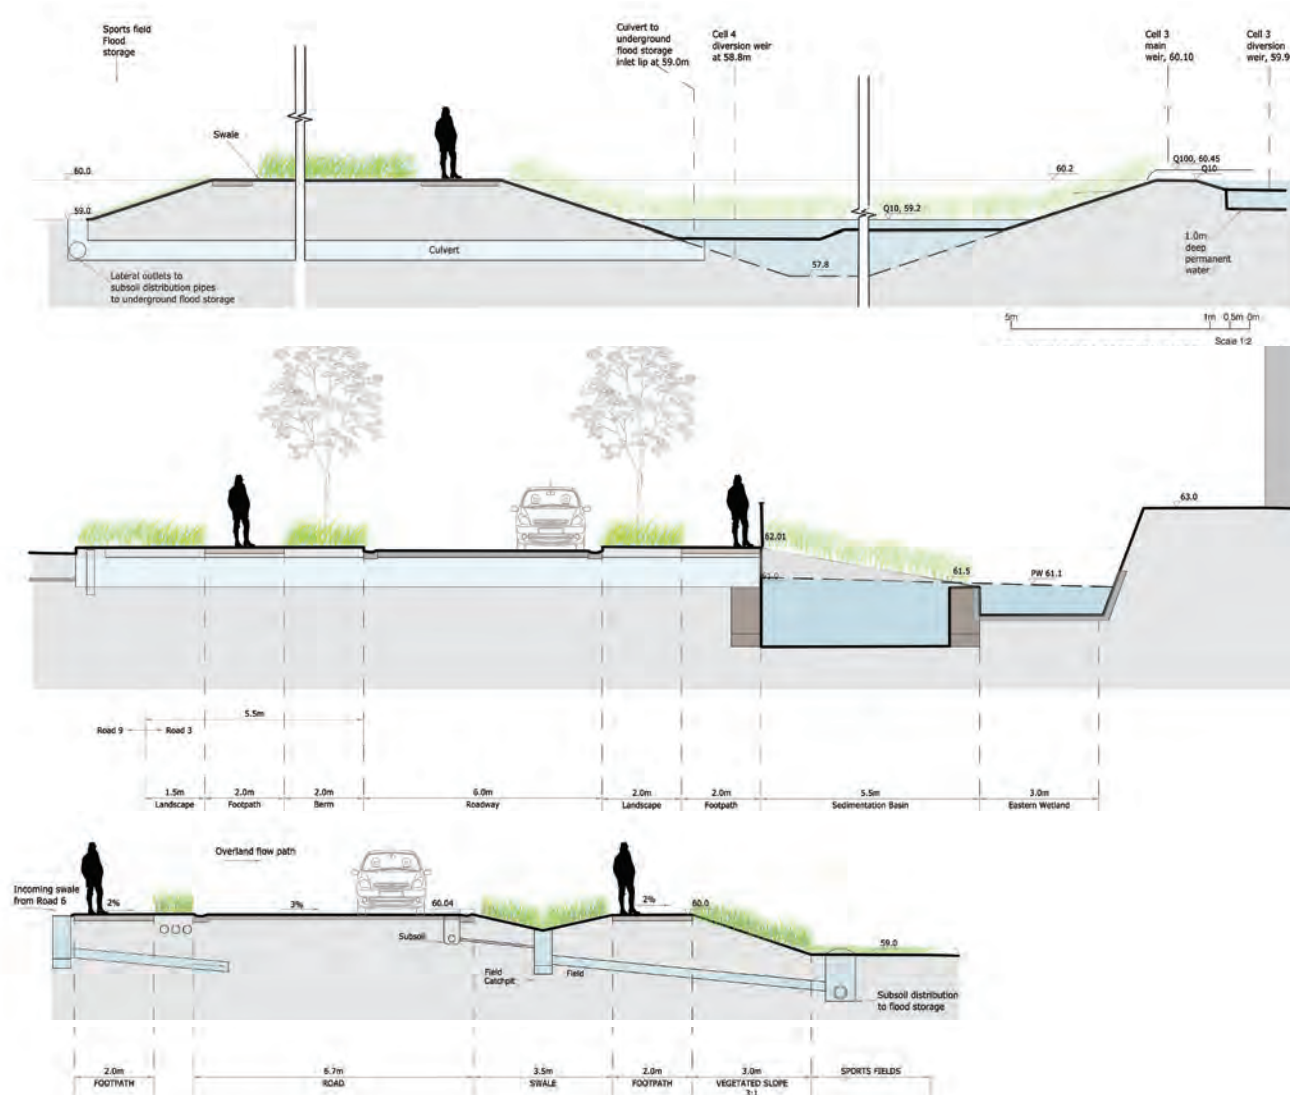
Sections of the engineered wetland treatment system integrated into the road network
